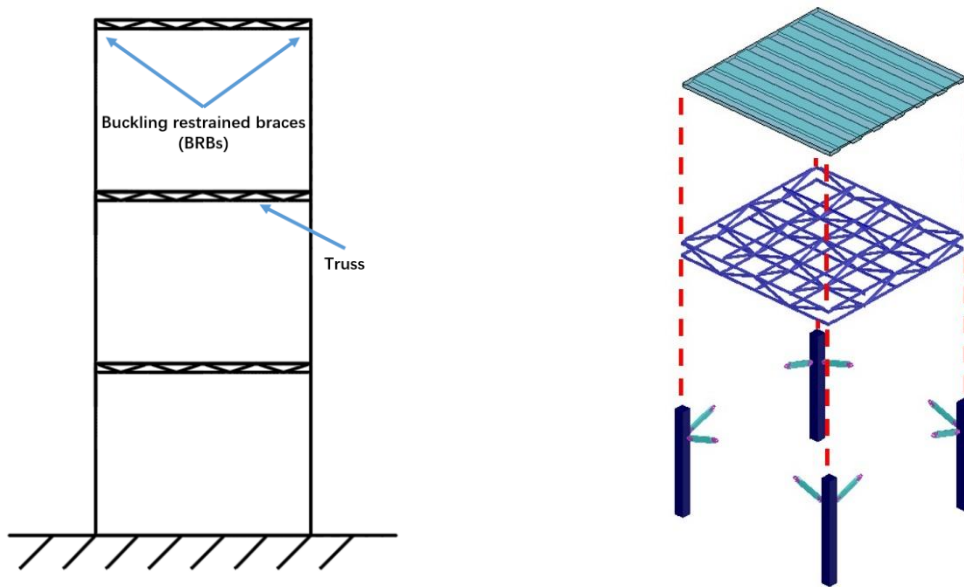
The proposed modular steel floor system (MSFS)
